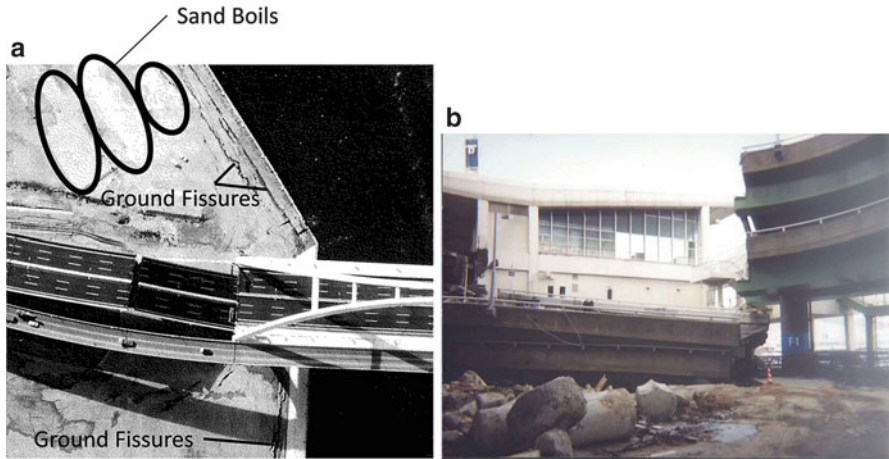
Fall of bridge girders by liquefaction-induced ground displacement (1995 Kobe earthquake). (a) Fall of a highway bridge. (b) Fall of a ramp of Kobe bridge
